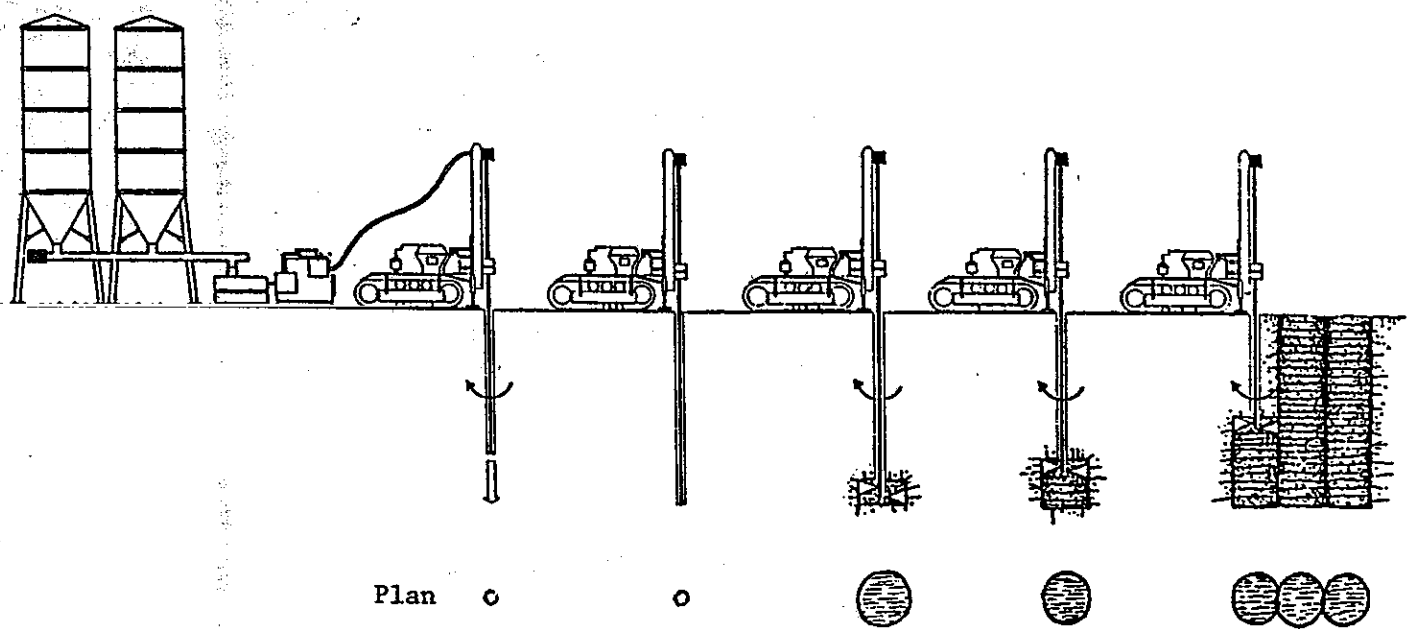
JET GROUTING: FORMATION OF STABILIZED SOIL COLUMNS
